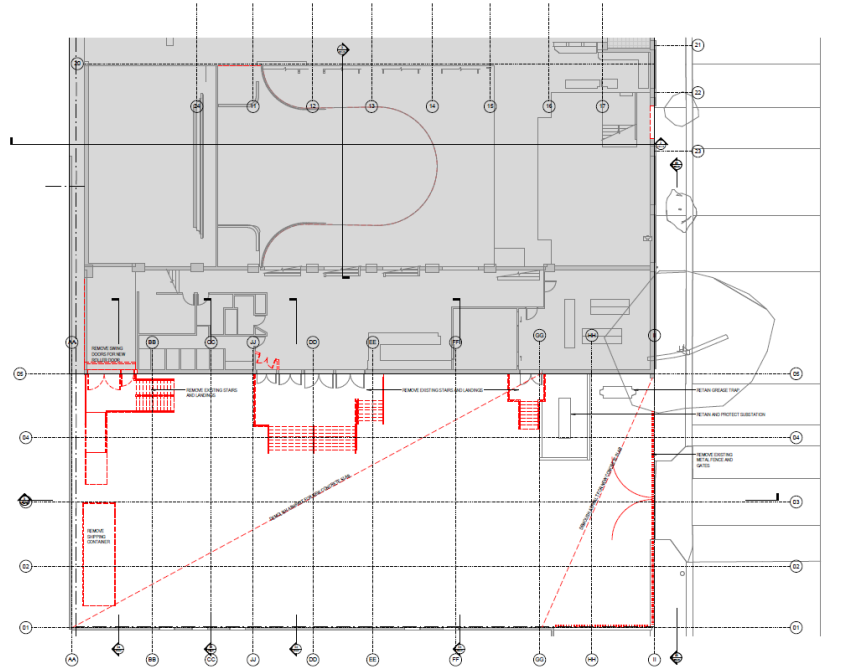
Existing/Demo Floor Plan (Source: JDA Co.) – refer attached PDF for full drawing
